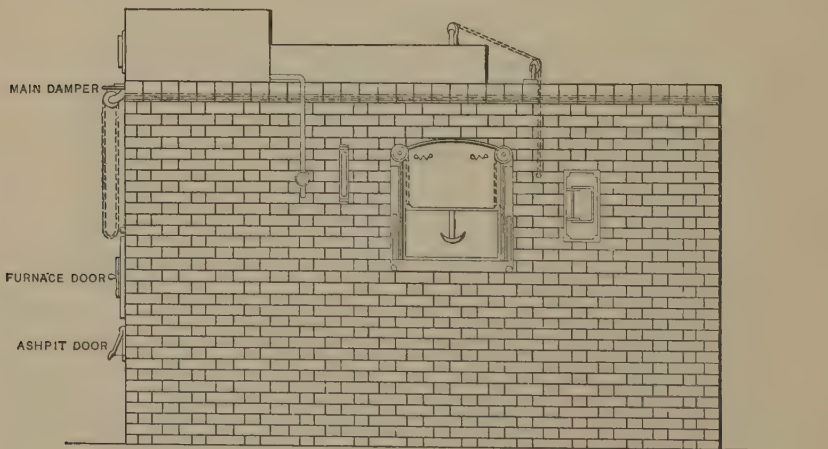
"Viennara" Patent Steam-pipe Oven: Front Elevation
